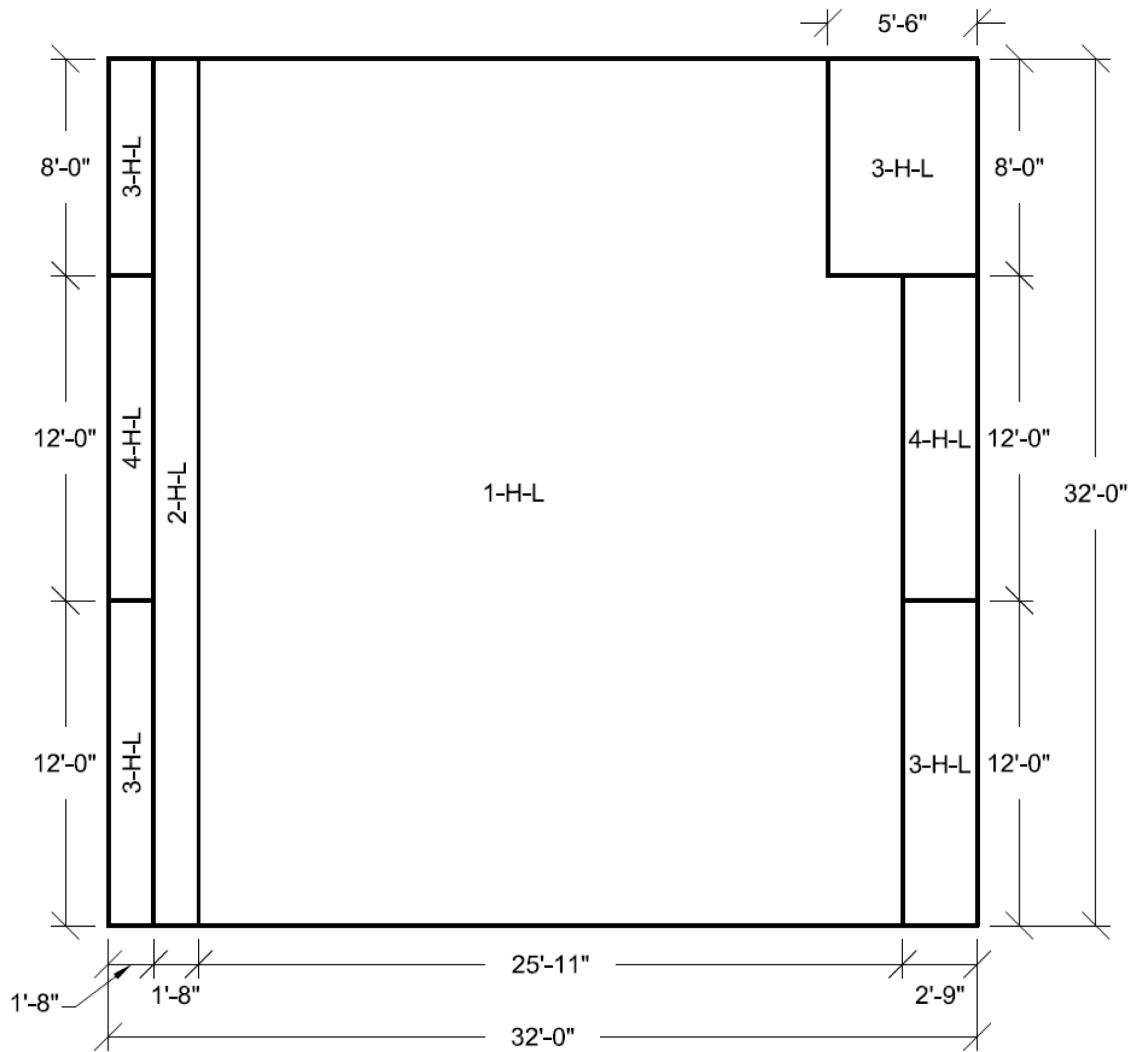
H.6-190 DGFSV Wall 13 Looking From Outside Horizontal Reinforcement Zones Near Side Face
